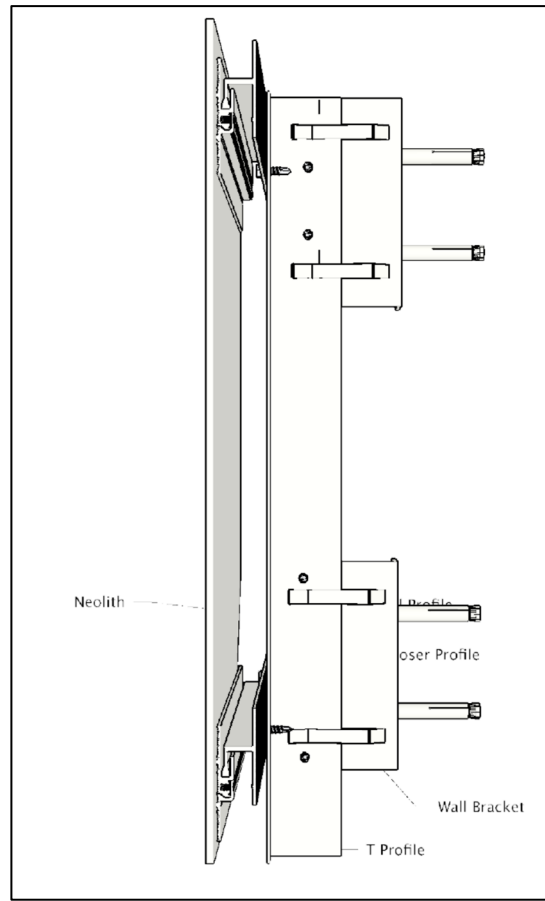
SIDE VIEW OF SYSTEM ASSEMBLY
